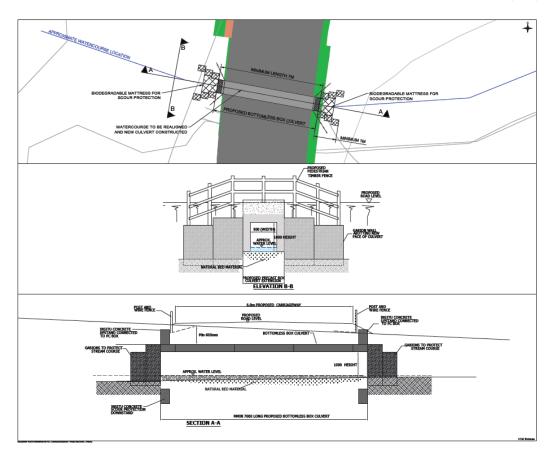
INDICATIVE DESIGN OF ACCESS TRACK CROSSING A WATERCOURSE
